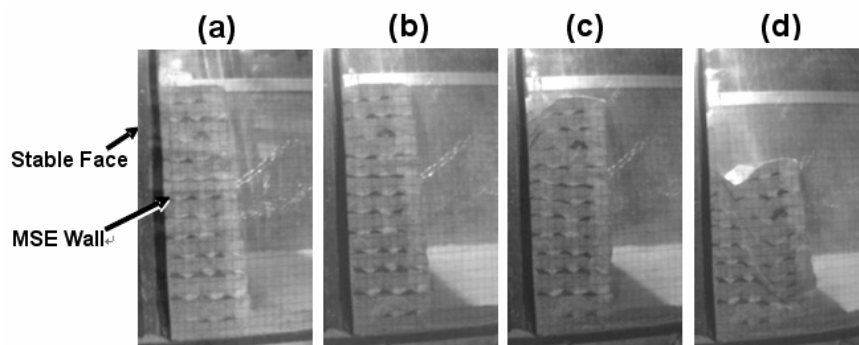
Photographic images from centrifuge: (a) Initial condition (gravity); (b) Working Stresses (10g); (c) Before Failure (41g); (d) Failure condition (41g) (from Woodruff, 2003)
